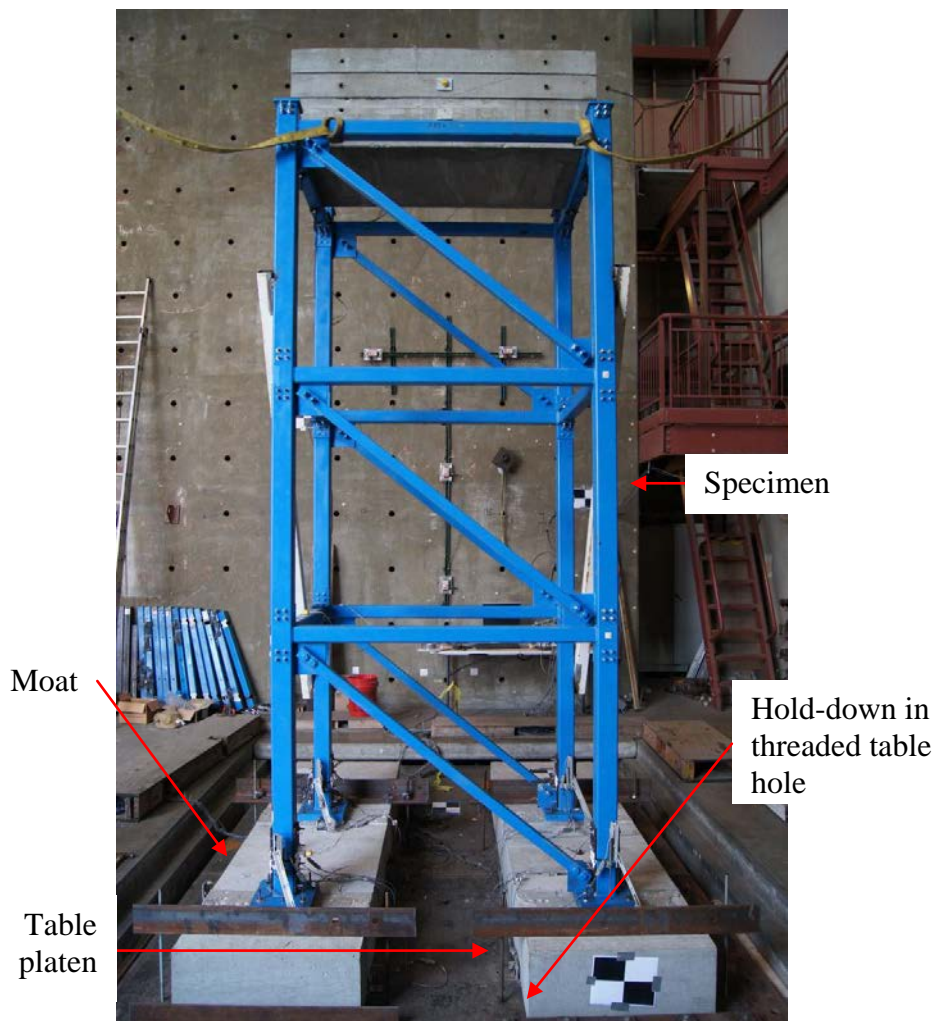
Picture of shake table with mounted specimen (picture taken along axis of shaking)
